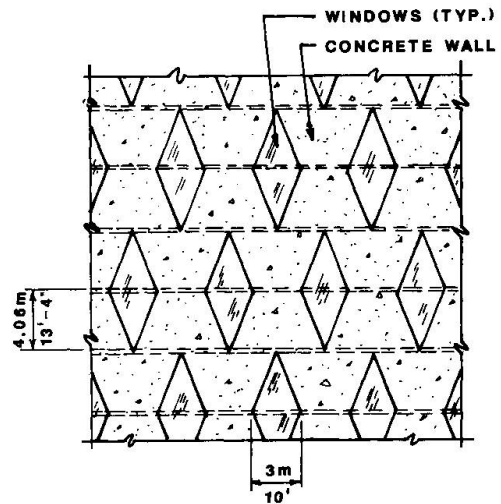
EXTERIOR WALL - TRUSSED TUBE
